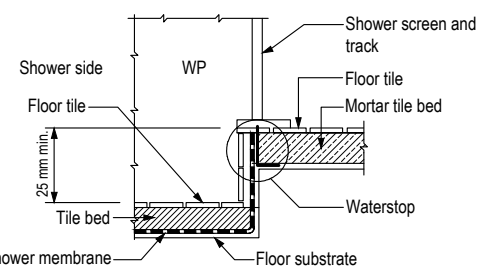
Typical enclosed stepped down shower construction (membrane above tile bed)
